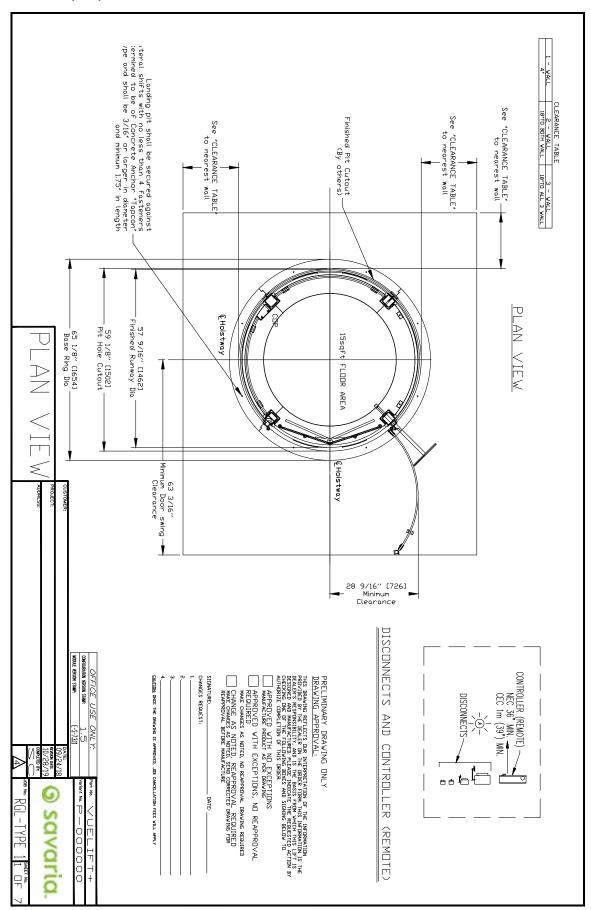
Pit/bottom floor/thru-floor view (RGL)
